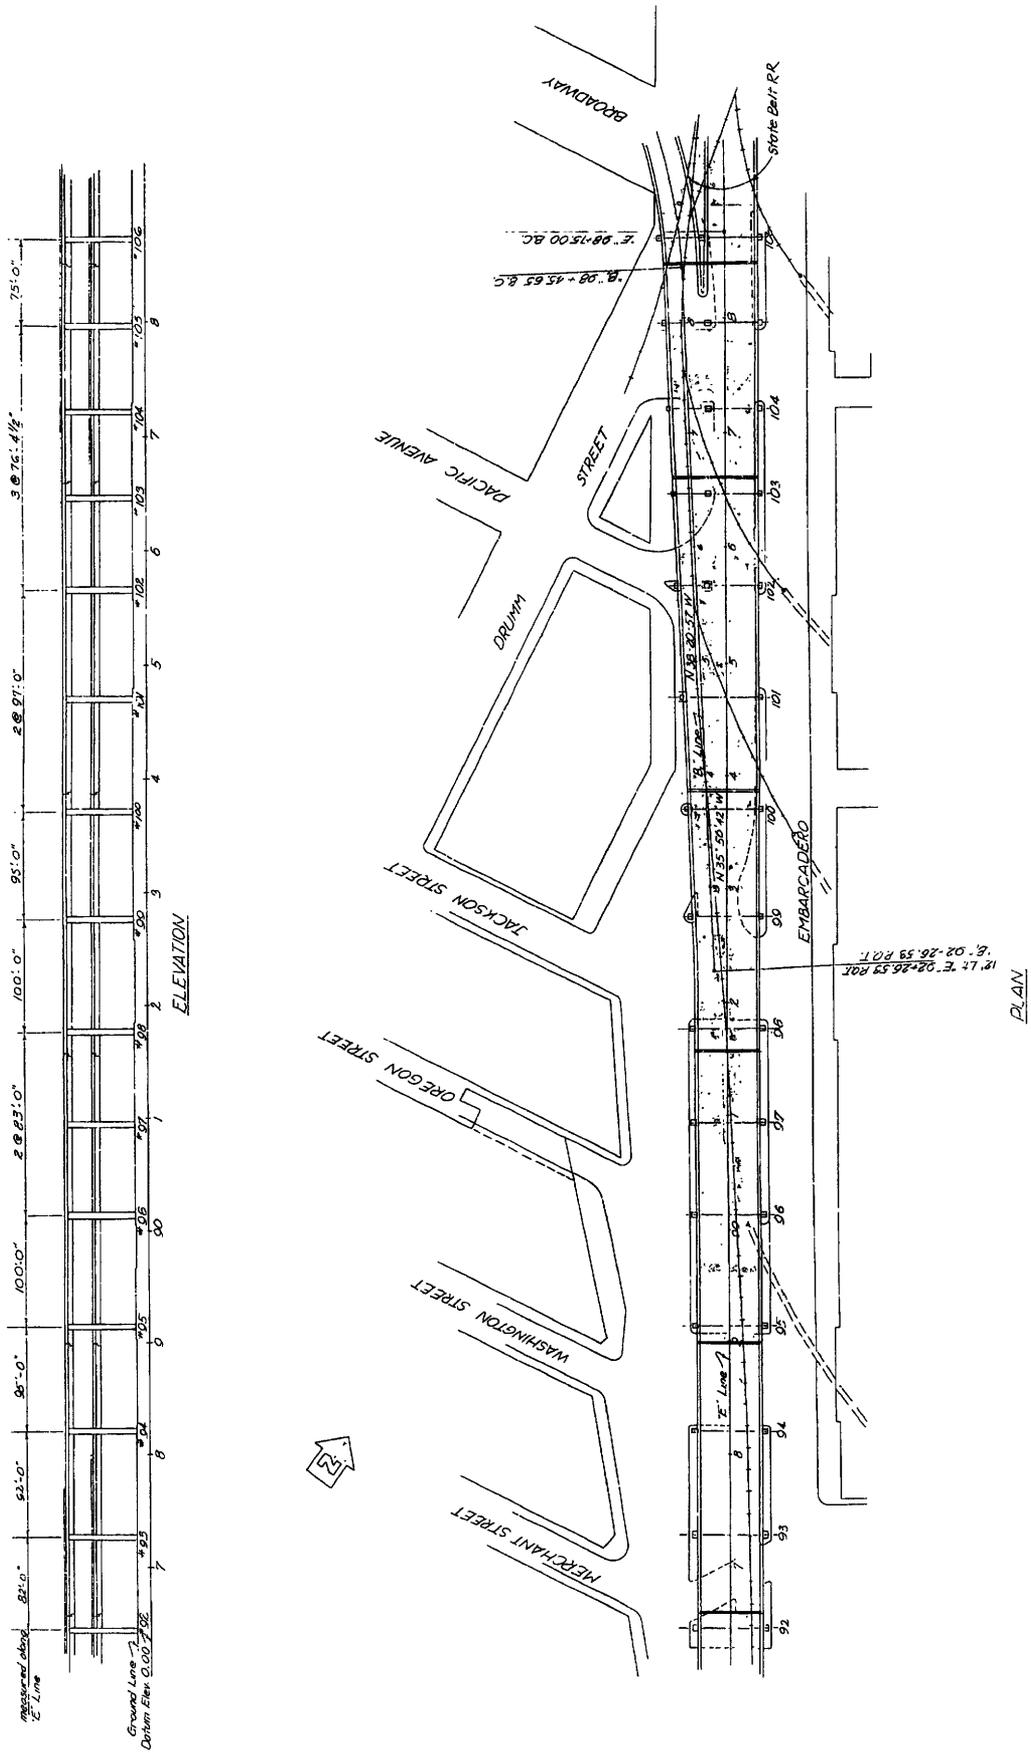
Structural Plan drawing for Embarcadero Viaduct.
